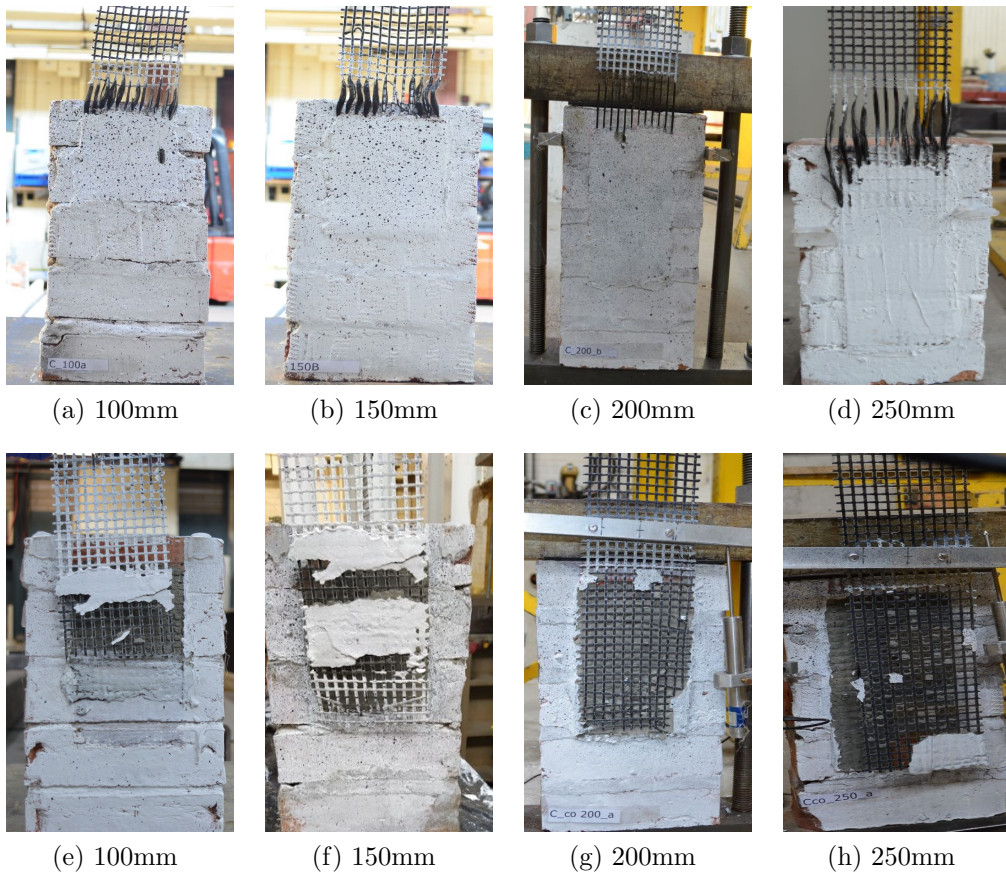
Typical failure modes of specimens strengthened with heavy carbon textile: (a)-(d) uncoated specimens, failure mode: Textile slippage; (e)-(h) coated specimens, failure mode: detachment.
